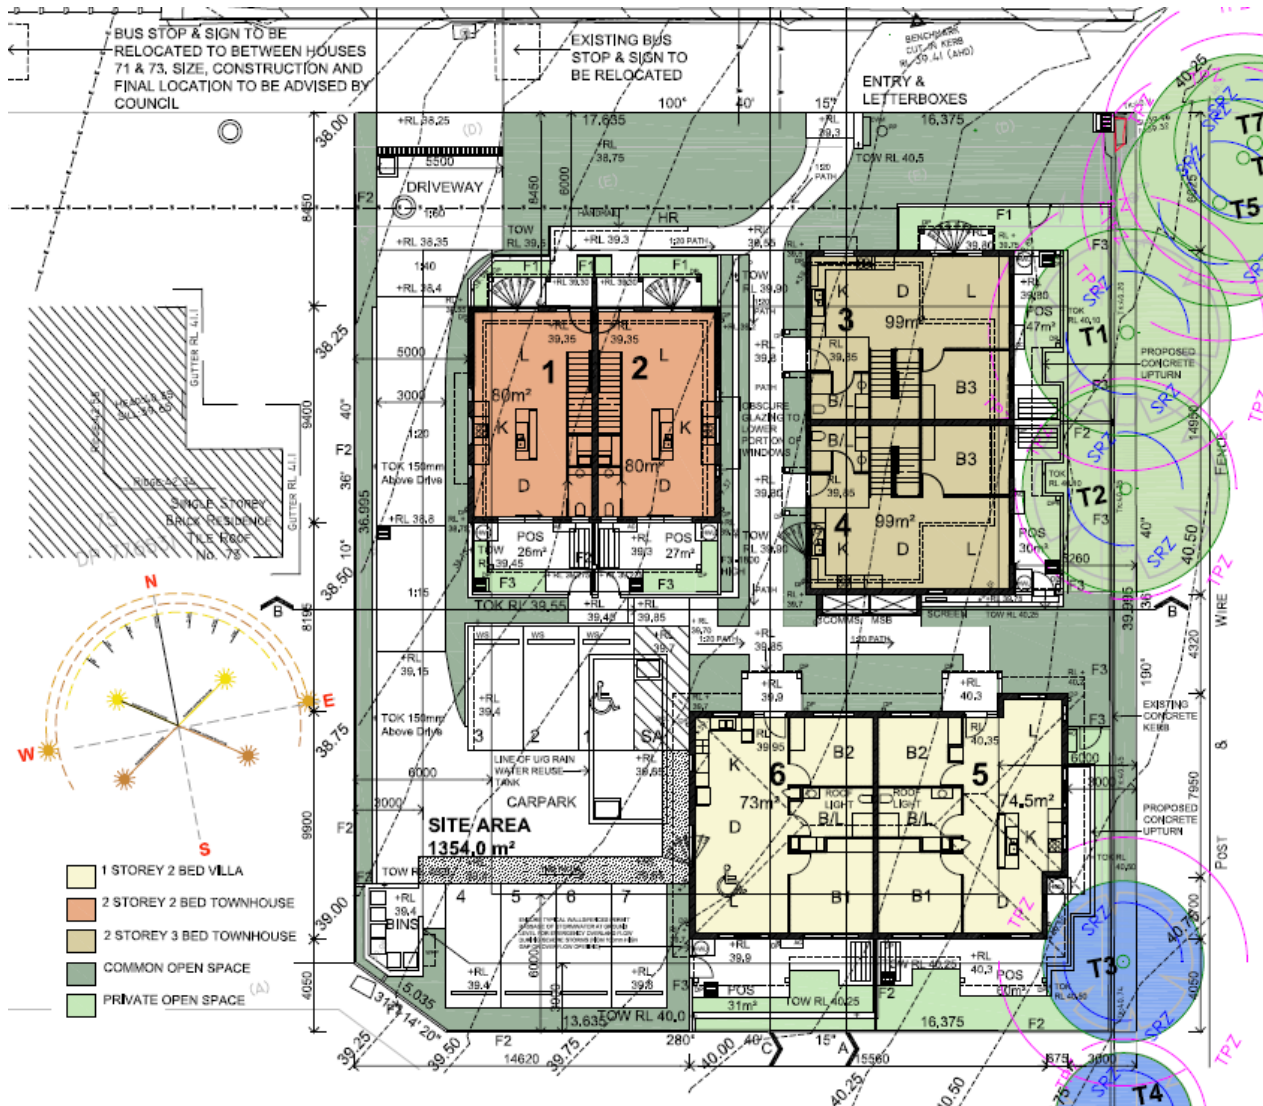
Extract from Architectural Plans – Site Plan (Source: Barry Rush and Associates, dated 03/05/2023)
